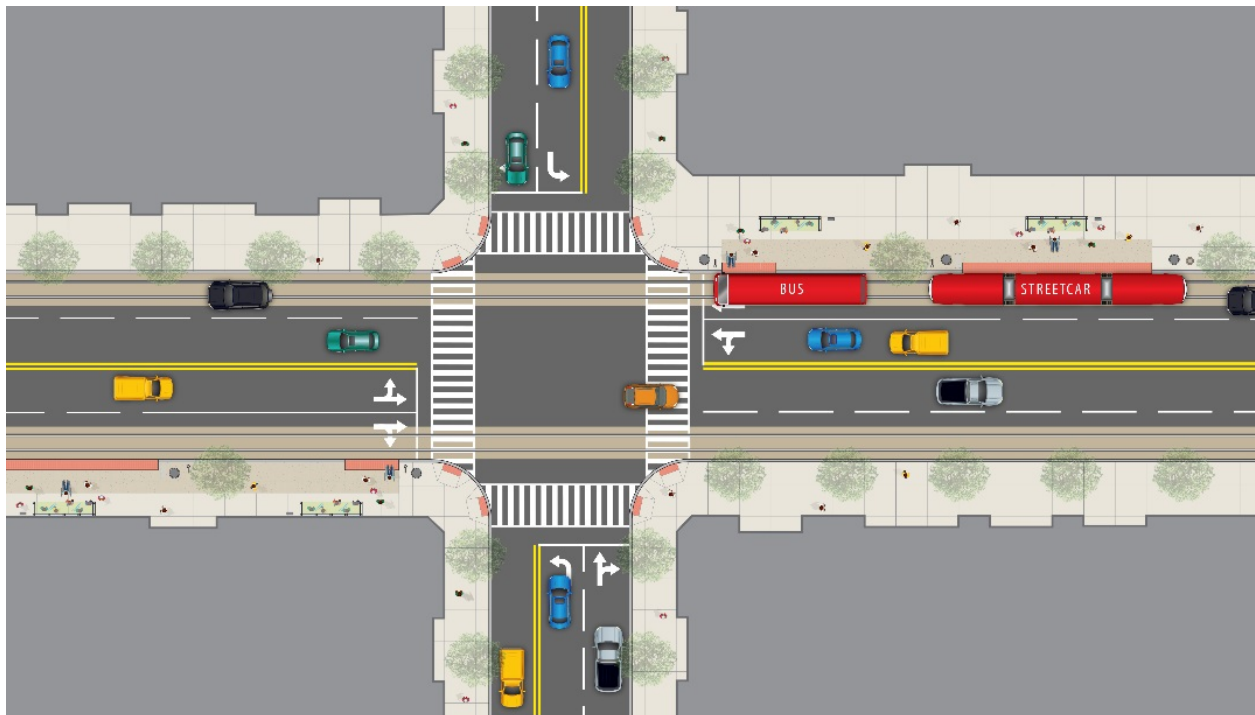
| Curbside Stop Platform (Streetcar only)
